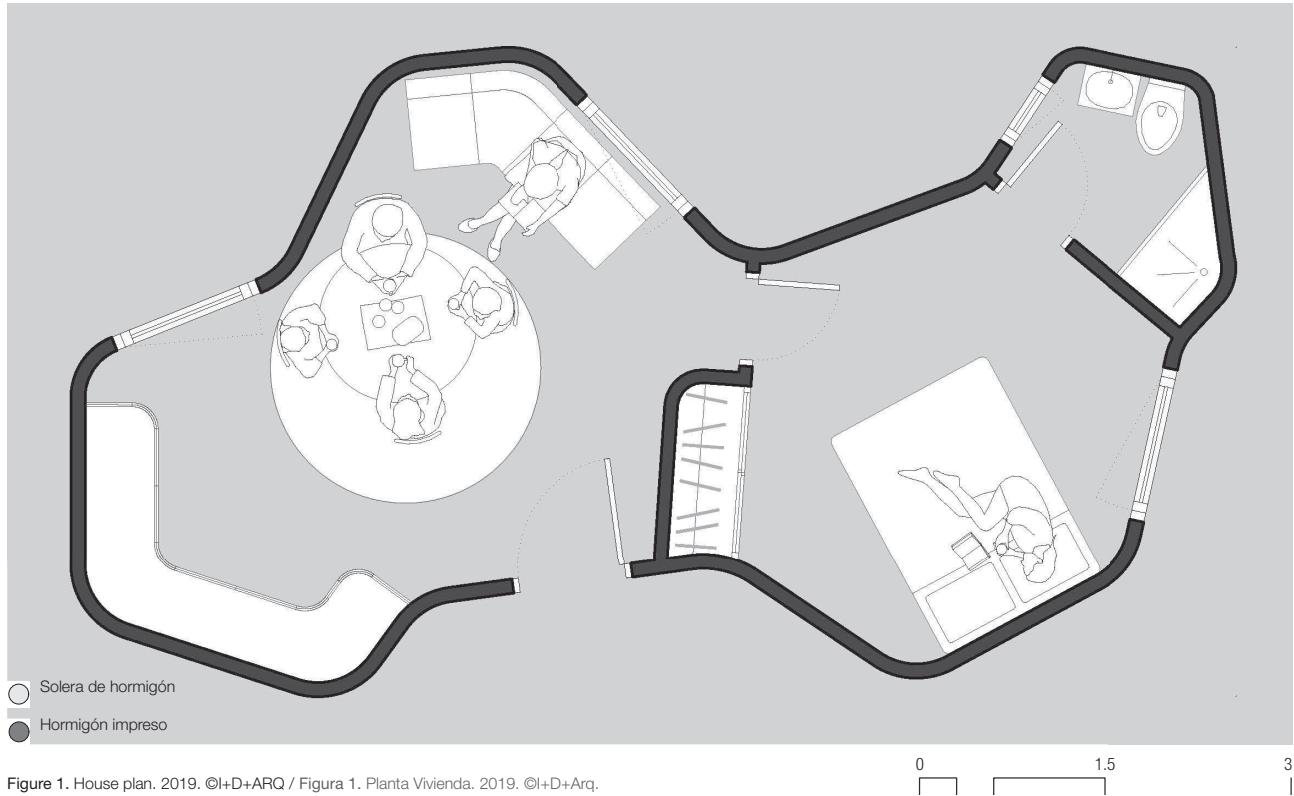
House plan. 2019. ©I+D+ARQ / Figura 1. Planta Vivienda. 2019. ©I+D+Arq.
